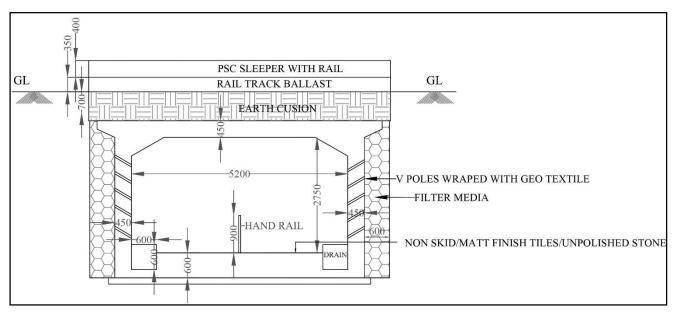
Typical Cross Section of PUP at Rotary Location
